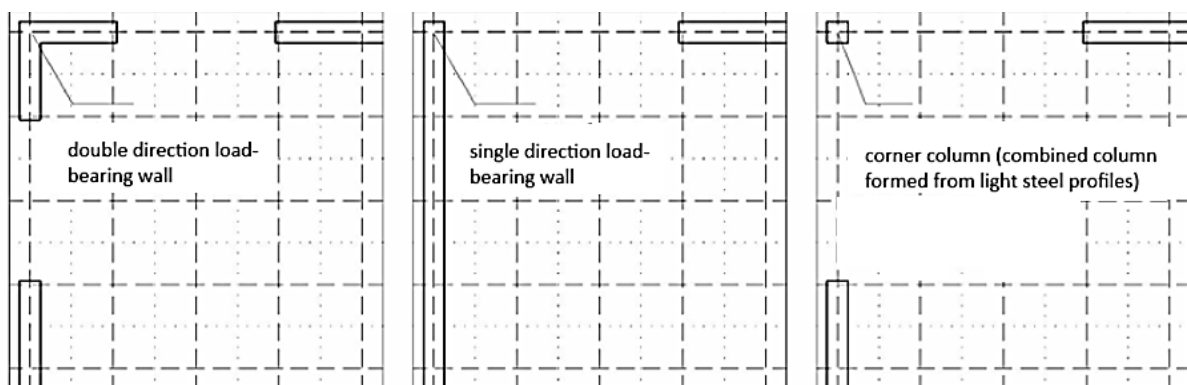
Examples Of Load-Bearing Walls On Facade (Yıldırım, 2010).
